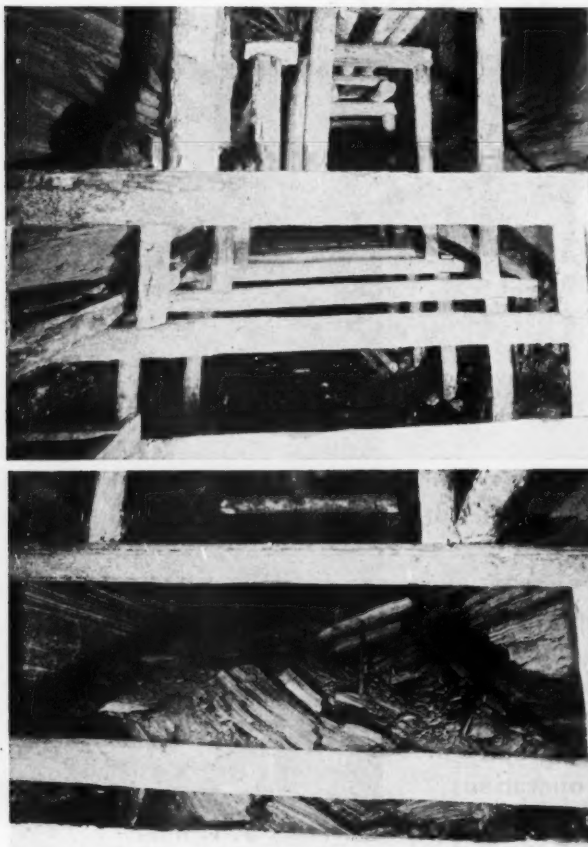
(left). Showing roof cave in a panel slope. Height of coal 7 ft. 6 in. Roof caved to an arch. Width of place 12 ft. "C" Mine, Superior
